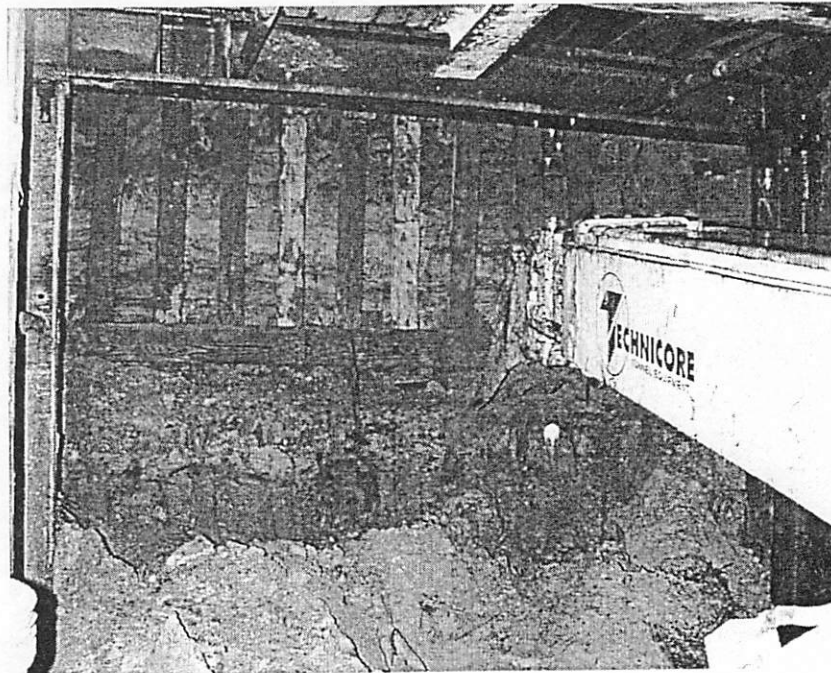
Tunnel Digging Machine Excavating Bench in Foundation Drift 1W
